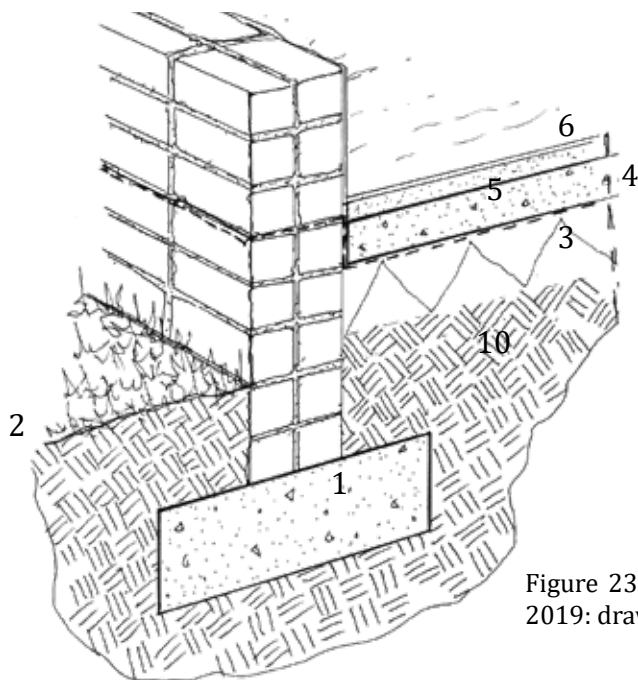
Standard foundation to be used: strip foundation (Caldeira, 2019: drawing).
